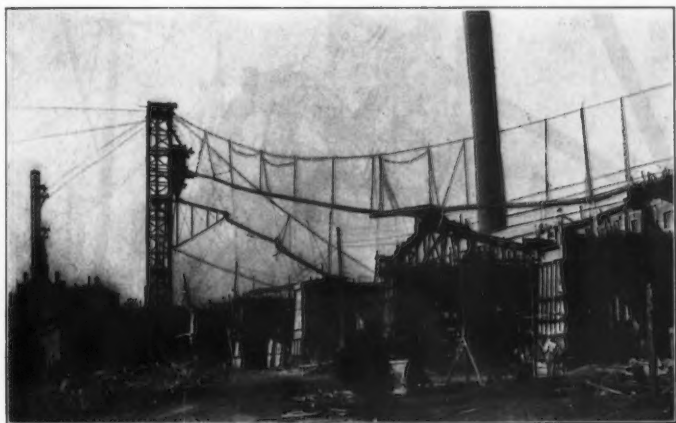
MAIN STREET VIADUCT: MOVABLE TOWER AND ARRANGEMENT OF CHUTES FOR CONCRETING PIERS BETWEEN PIER 4 AND NORTH ABUTMENT.
